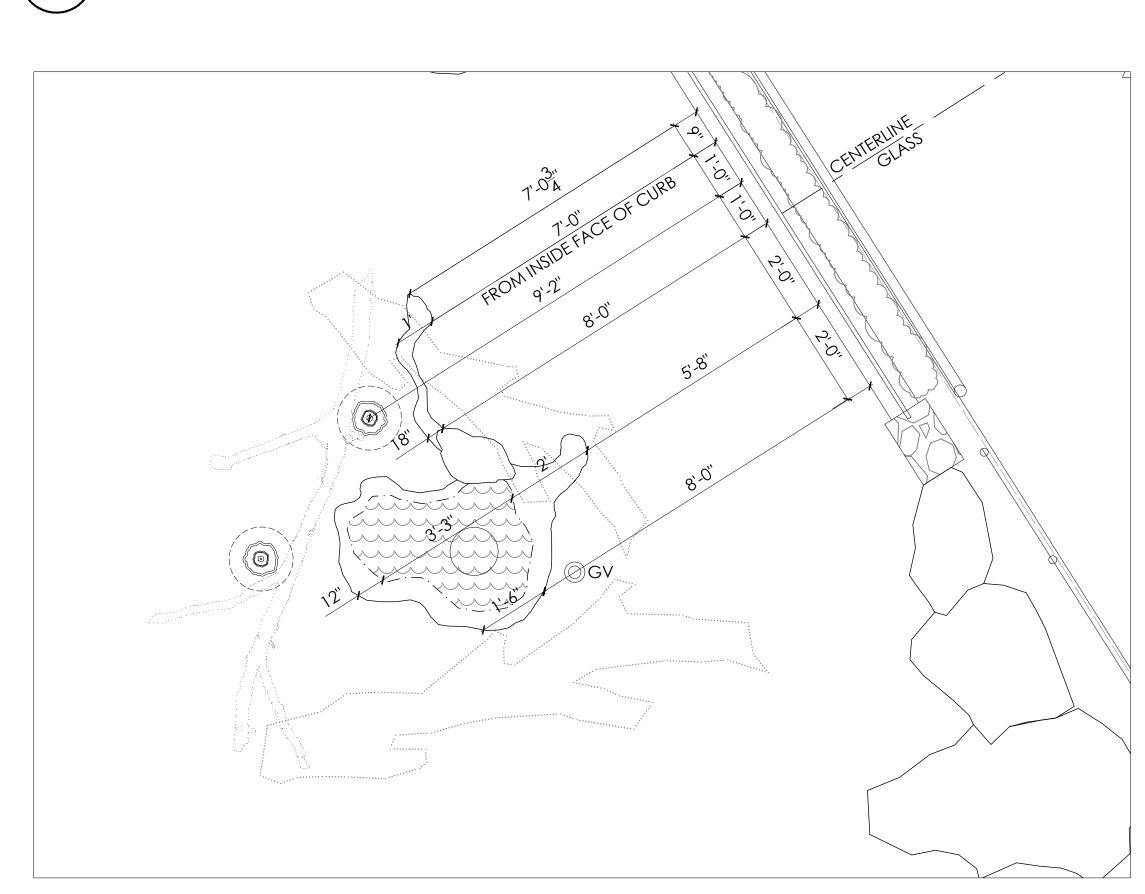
DETAILED LAYOUT PLAN BOBCAT WATER FEATURE
